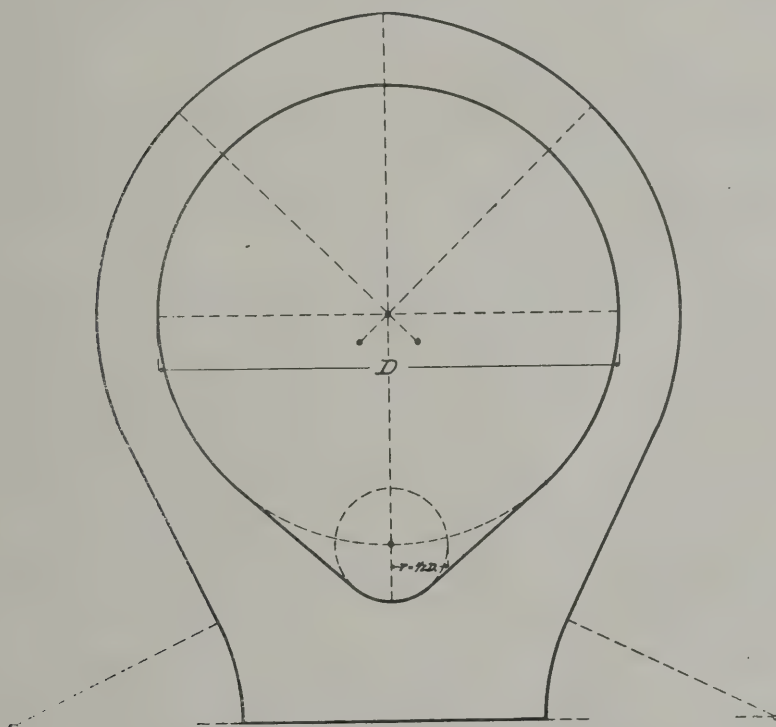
TYPICAL SECTIONAL FORM OF SEWER.
